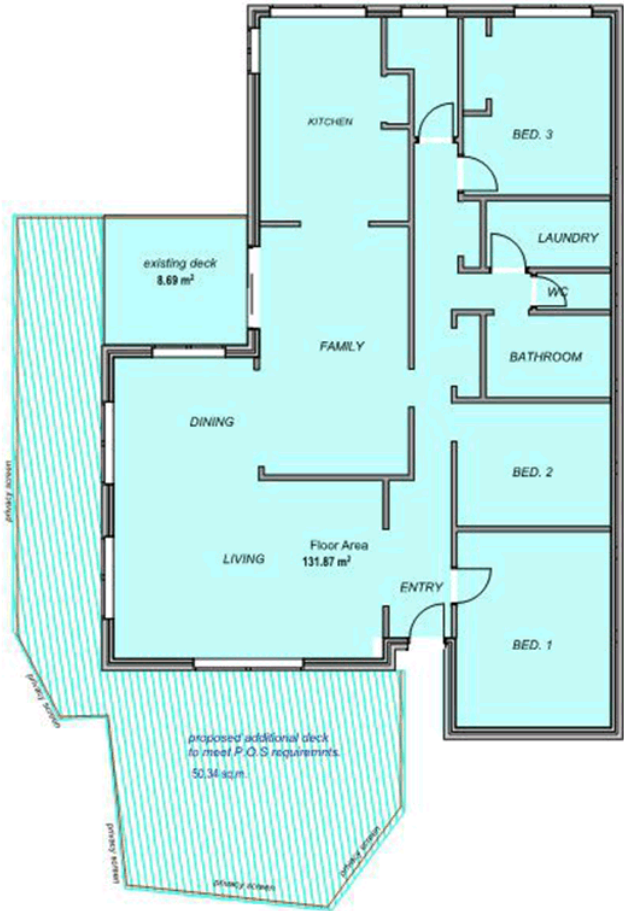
Upper floor plan with proposed deck to be constructed to provide private open space to that dwelling) (Stary, 2022)
